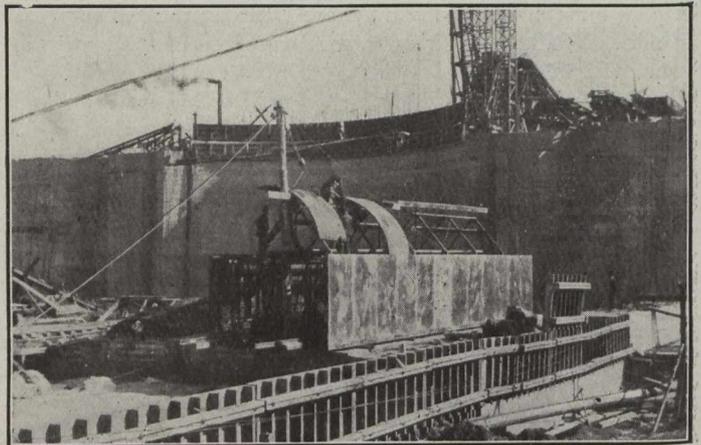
Lock 2 Breast Wall Under Construction and Forms Being Erected for Filling Tunnel in the West Lock Wall.
